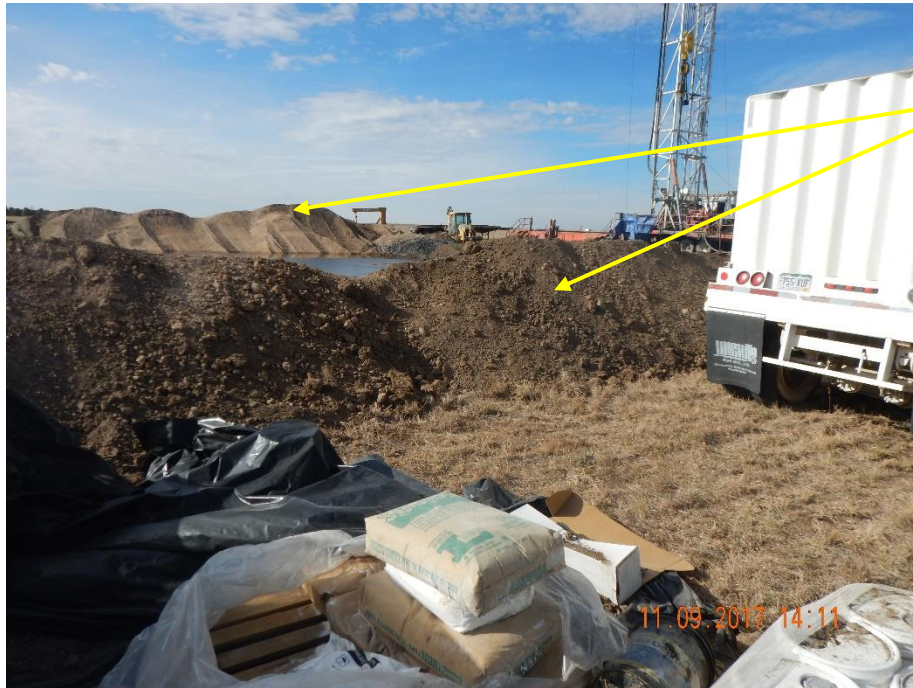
Photo taken from the east end of the pit. Previous inspections documented that soil around pit are loose materials and have not been stabilized. Inspection required operator to implement BMPs to stabilize soils. Photo shows soil stockpile berm on the east (and west) end of the pit remains unstabilized.
